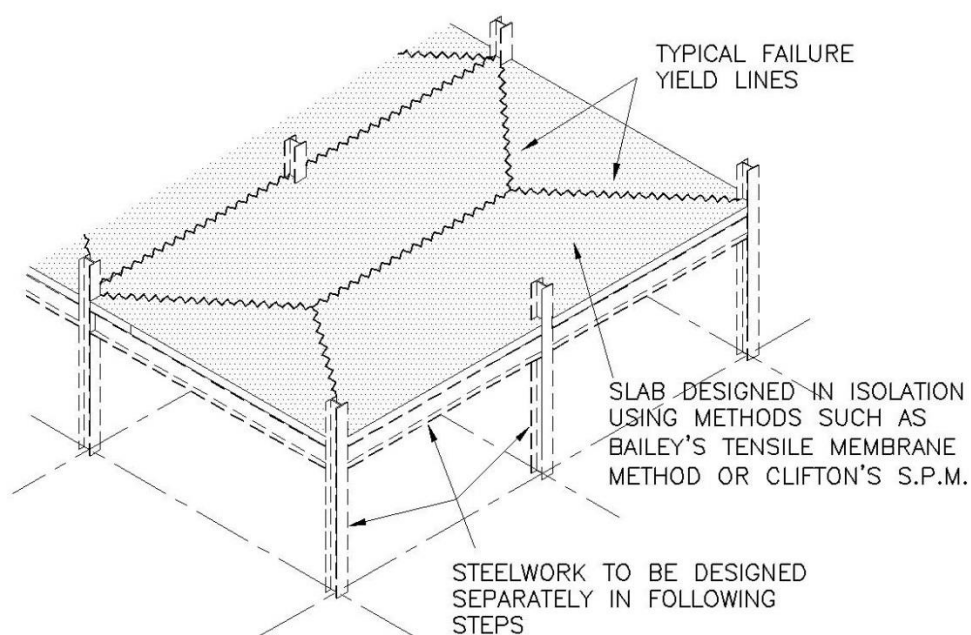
Typical layout and details considered for the design of a composite structure.
